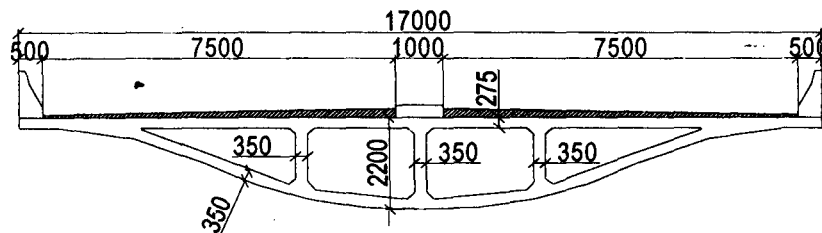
Typical cross section with Fish belly for 4-lane deck
